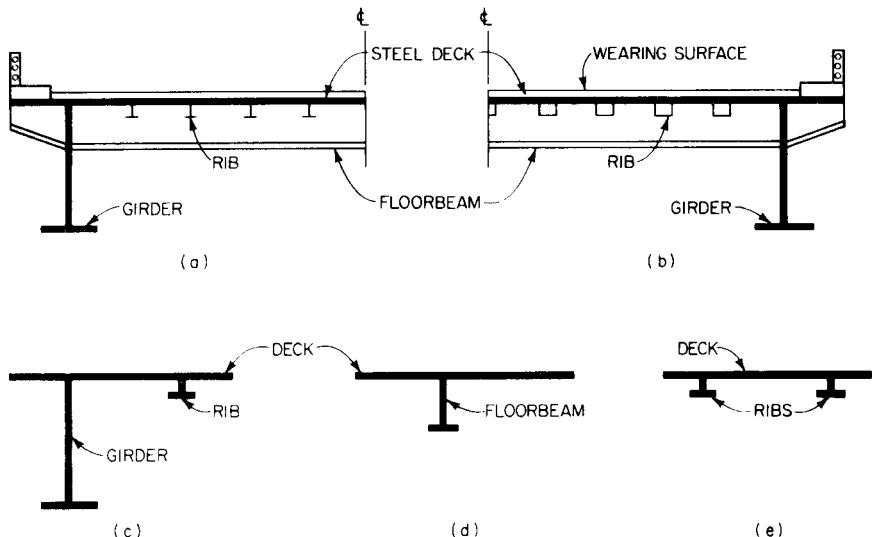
Orthotropic-plate construction. (a) With open ribs. (b) With closed ribs. (c) Deck and ribs act as the top flange of the main girder. (d) Deck acts as the top flange of the floorbeam. (e) Deck distributes loads to the ribs.
